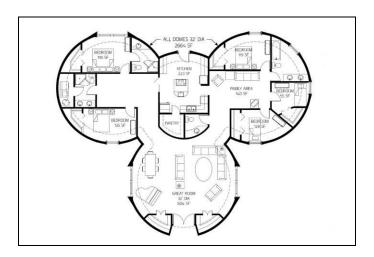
Contemporary American Floor Plan offering. http://www.monolithic.org/homes/floorplans/series/europa/floor-plan-dl-3204/photos.
